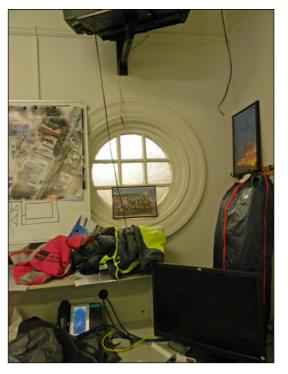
Fireplace in Area 5A, southern wall. Figure 68: Oriel window in Area 5A, southern wall.
